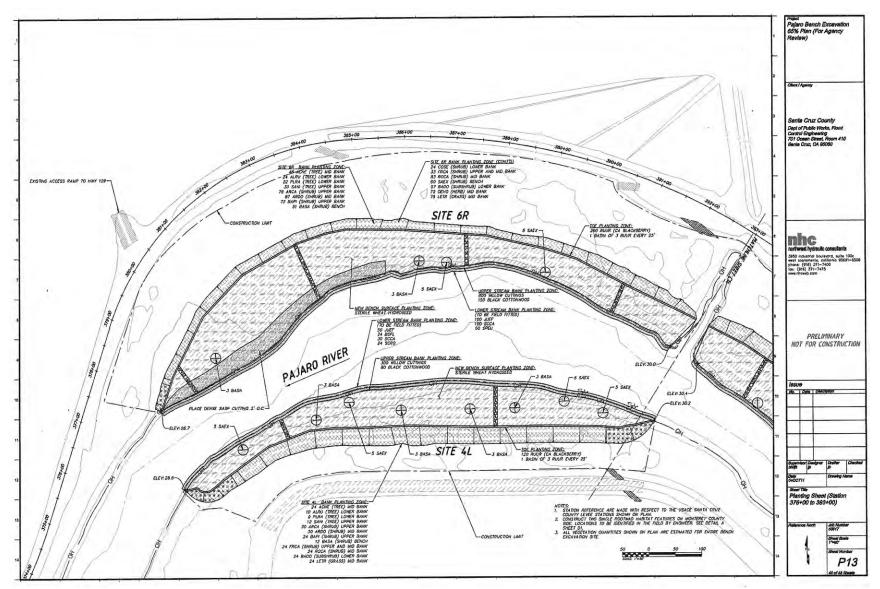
Typical Bench Excavation Area Design Revegetation Plan Sheet
